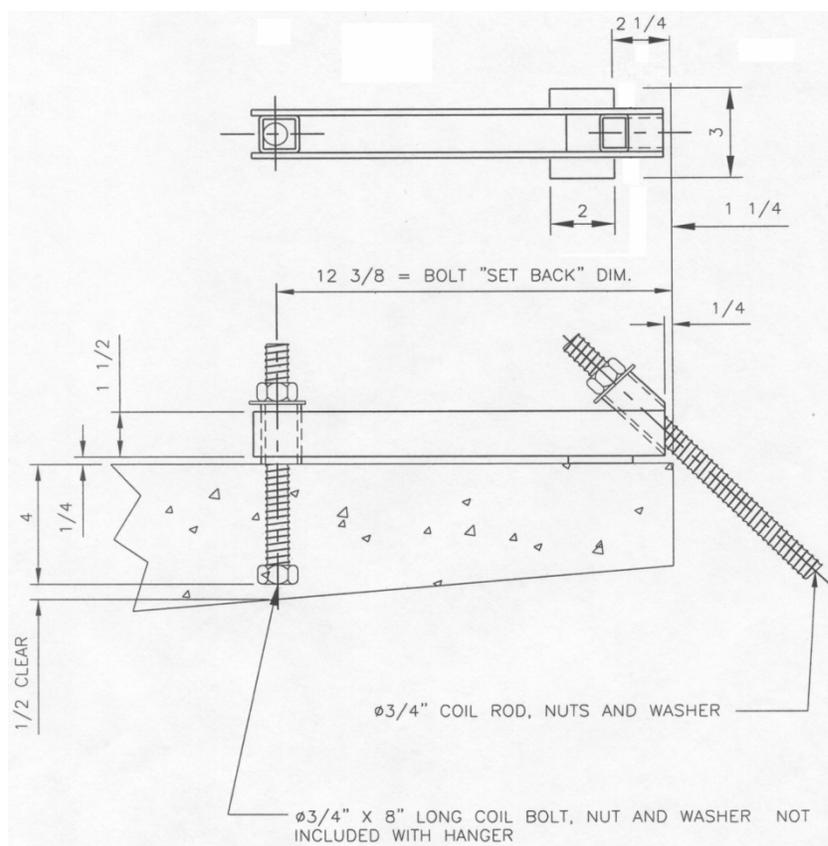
HF-67 Bulb Tee Bar Hanger (Meadow Burke Road & Bridge Catalog, 2006)
